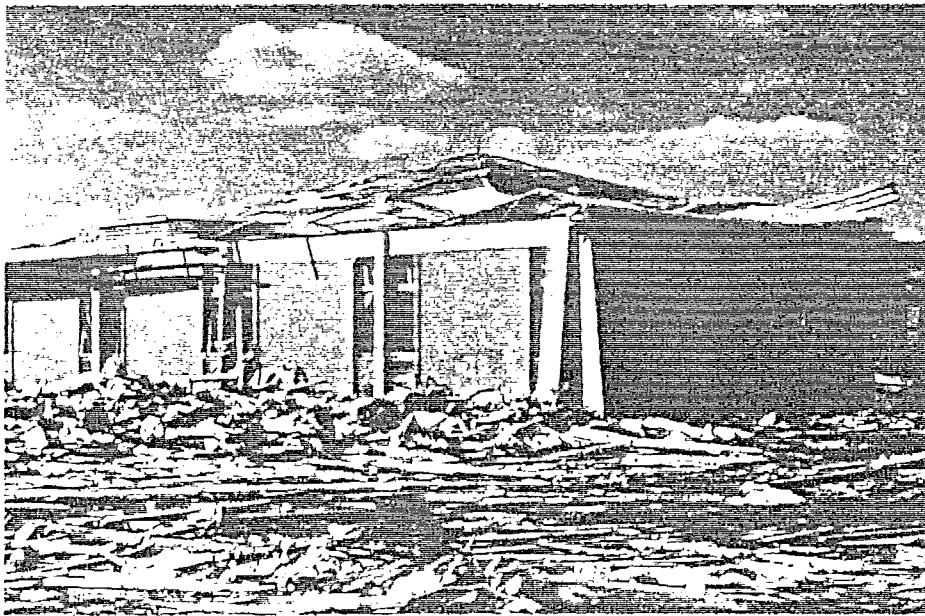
ARROWOOD ELEMENTARY SCHOOL, SOUTHEAST CORNER. The roof corner is uplifted and the windows to the classroom are broken. There was no damage to structural frame. Note the amount of debris that has collected outside of school.
